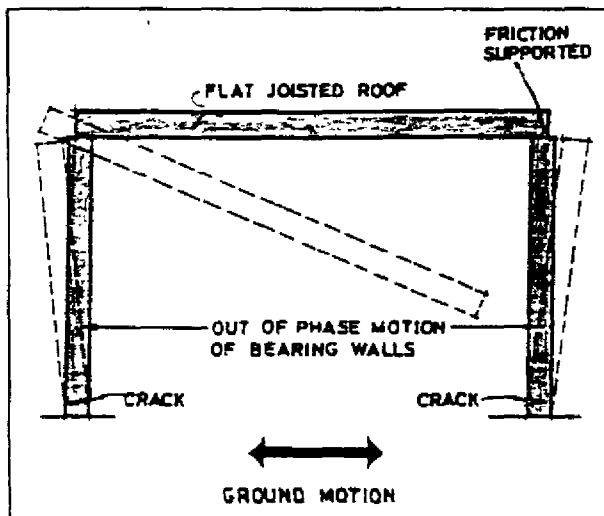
Fall of Roof because of Inadequate Connection between Roof of Wall [1]
